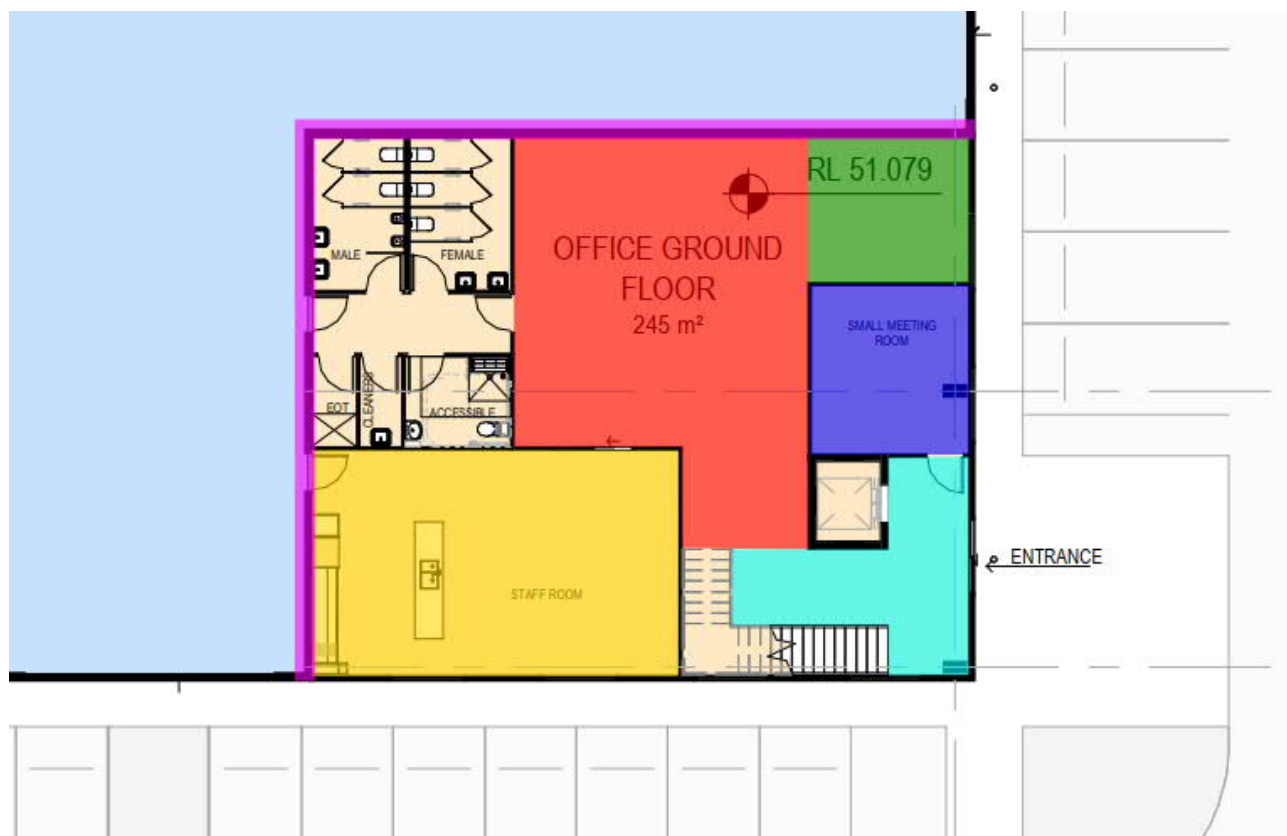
HVAC zones & thermal envelope for 10 McLaren Drive Ground Floor
